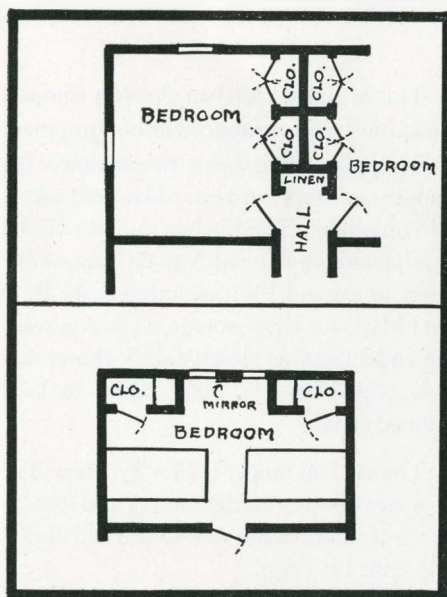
is a walk-in type of closet with storage space for two persons in each room. Each closet is 36 inches deep and 66 inches long. The illustration shows double doors which are preferable but a single door 30 inches wide may be used. If a single door is used, it should be centered.
